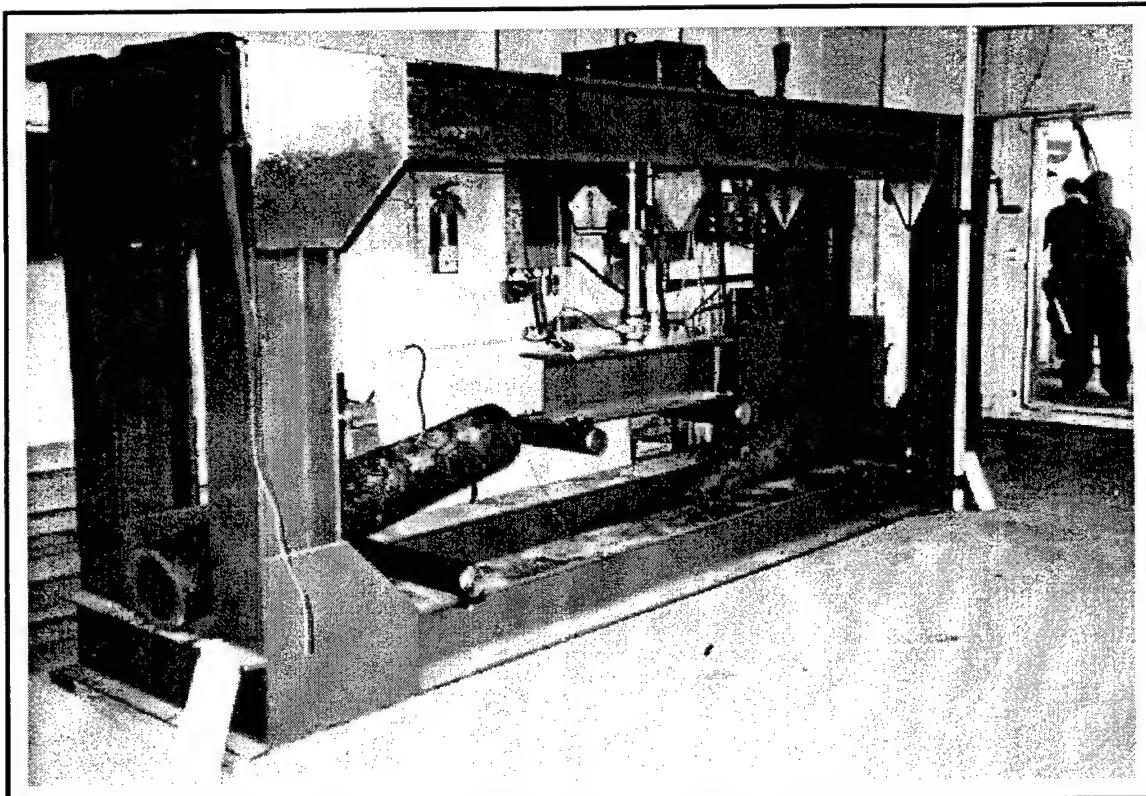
Specimen failed so violently at failure that the section on the left side flipped over in the test fixture.
